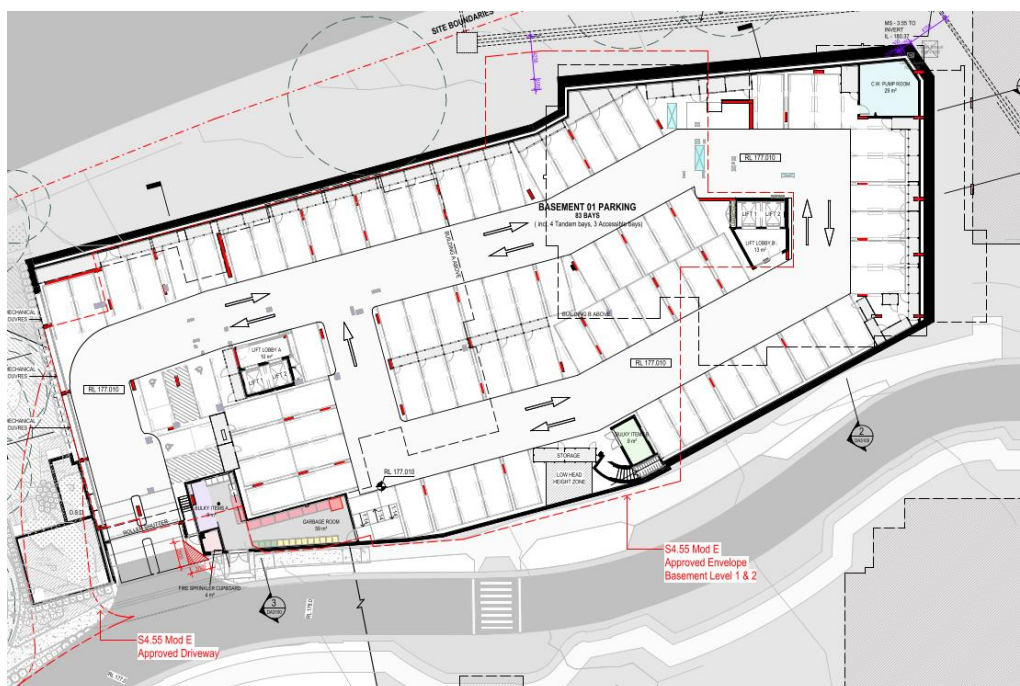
Basement 01 Plan prepared by Group GSA - identifies - identifies approved modified building envelope in red, reconfigured basement level and new vehicular access.
